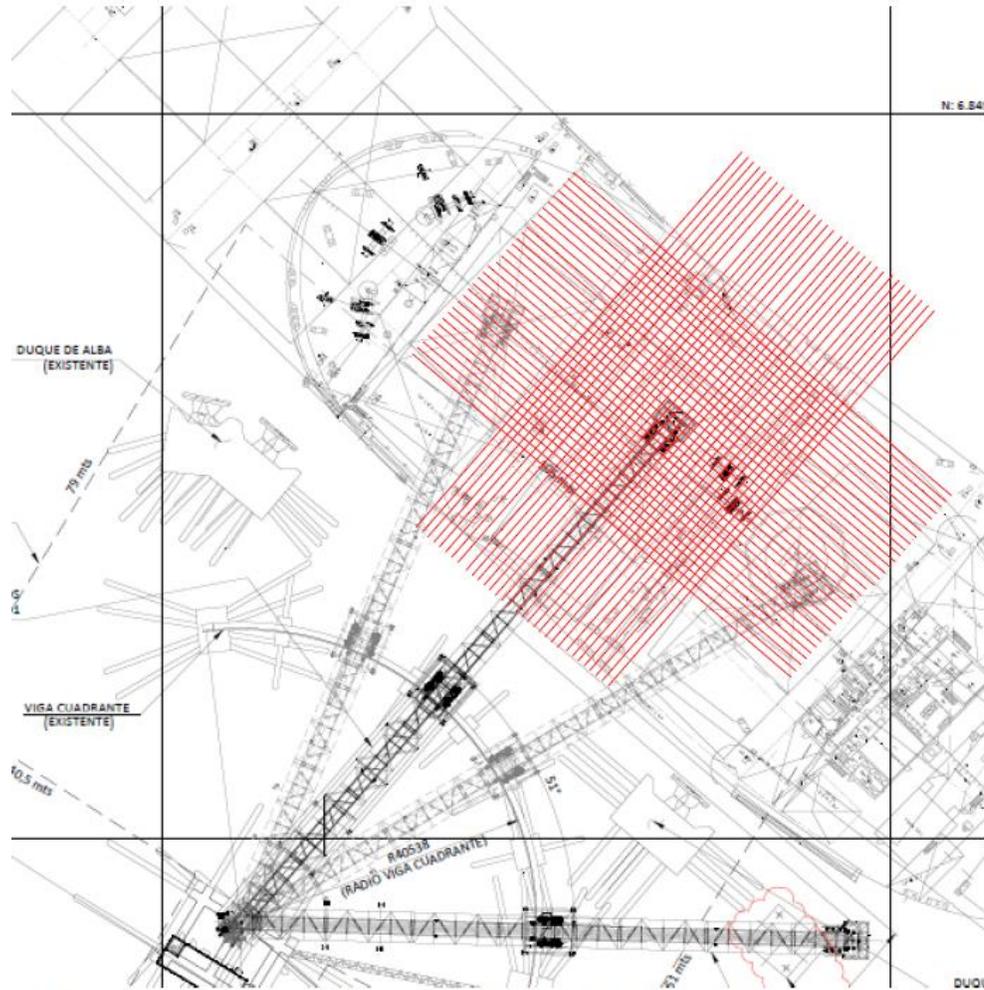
Drawing Mounting position Ship Hatch Collision Prevention (top view)
